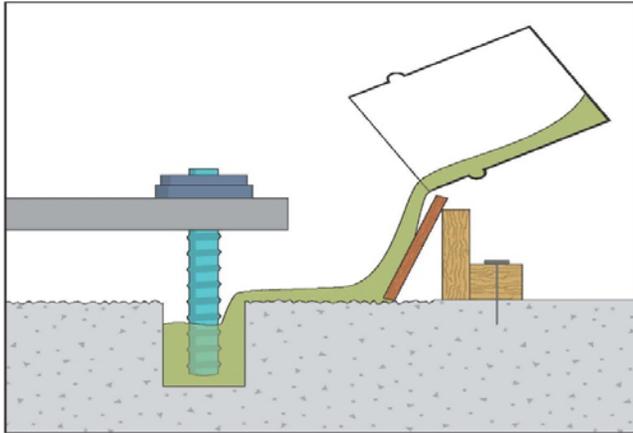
Filling bolt pockets with grout mixed in buckets showing the sloping board to minimise air entrainment
